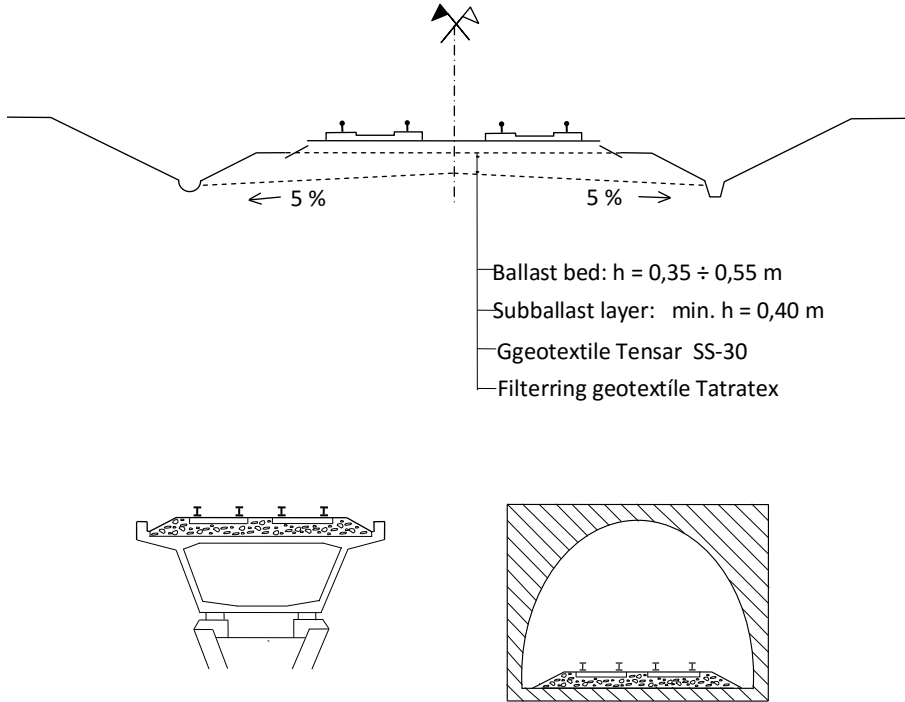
Ballasted tracks on soils, a bridge, and in a tunnel.
